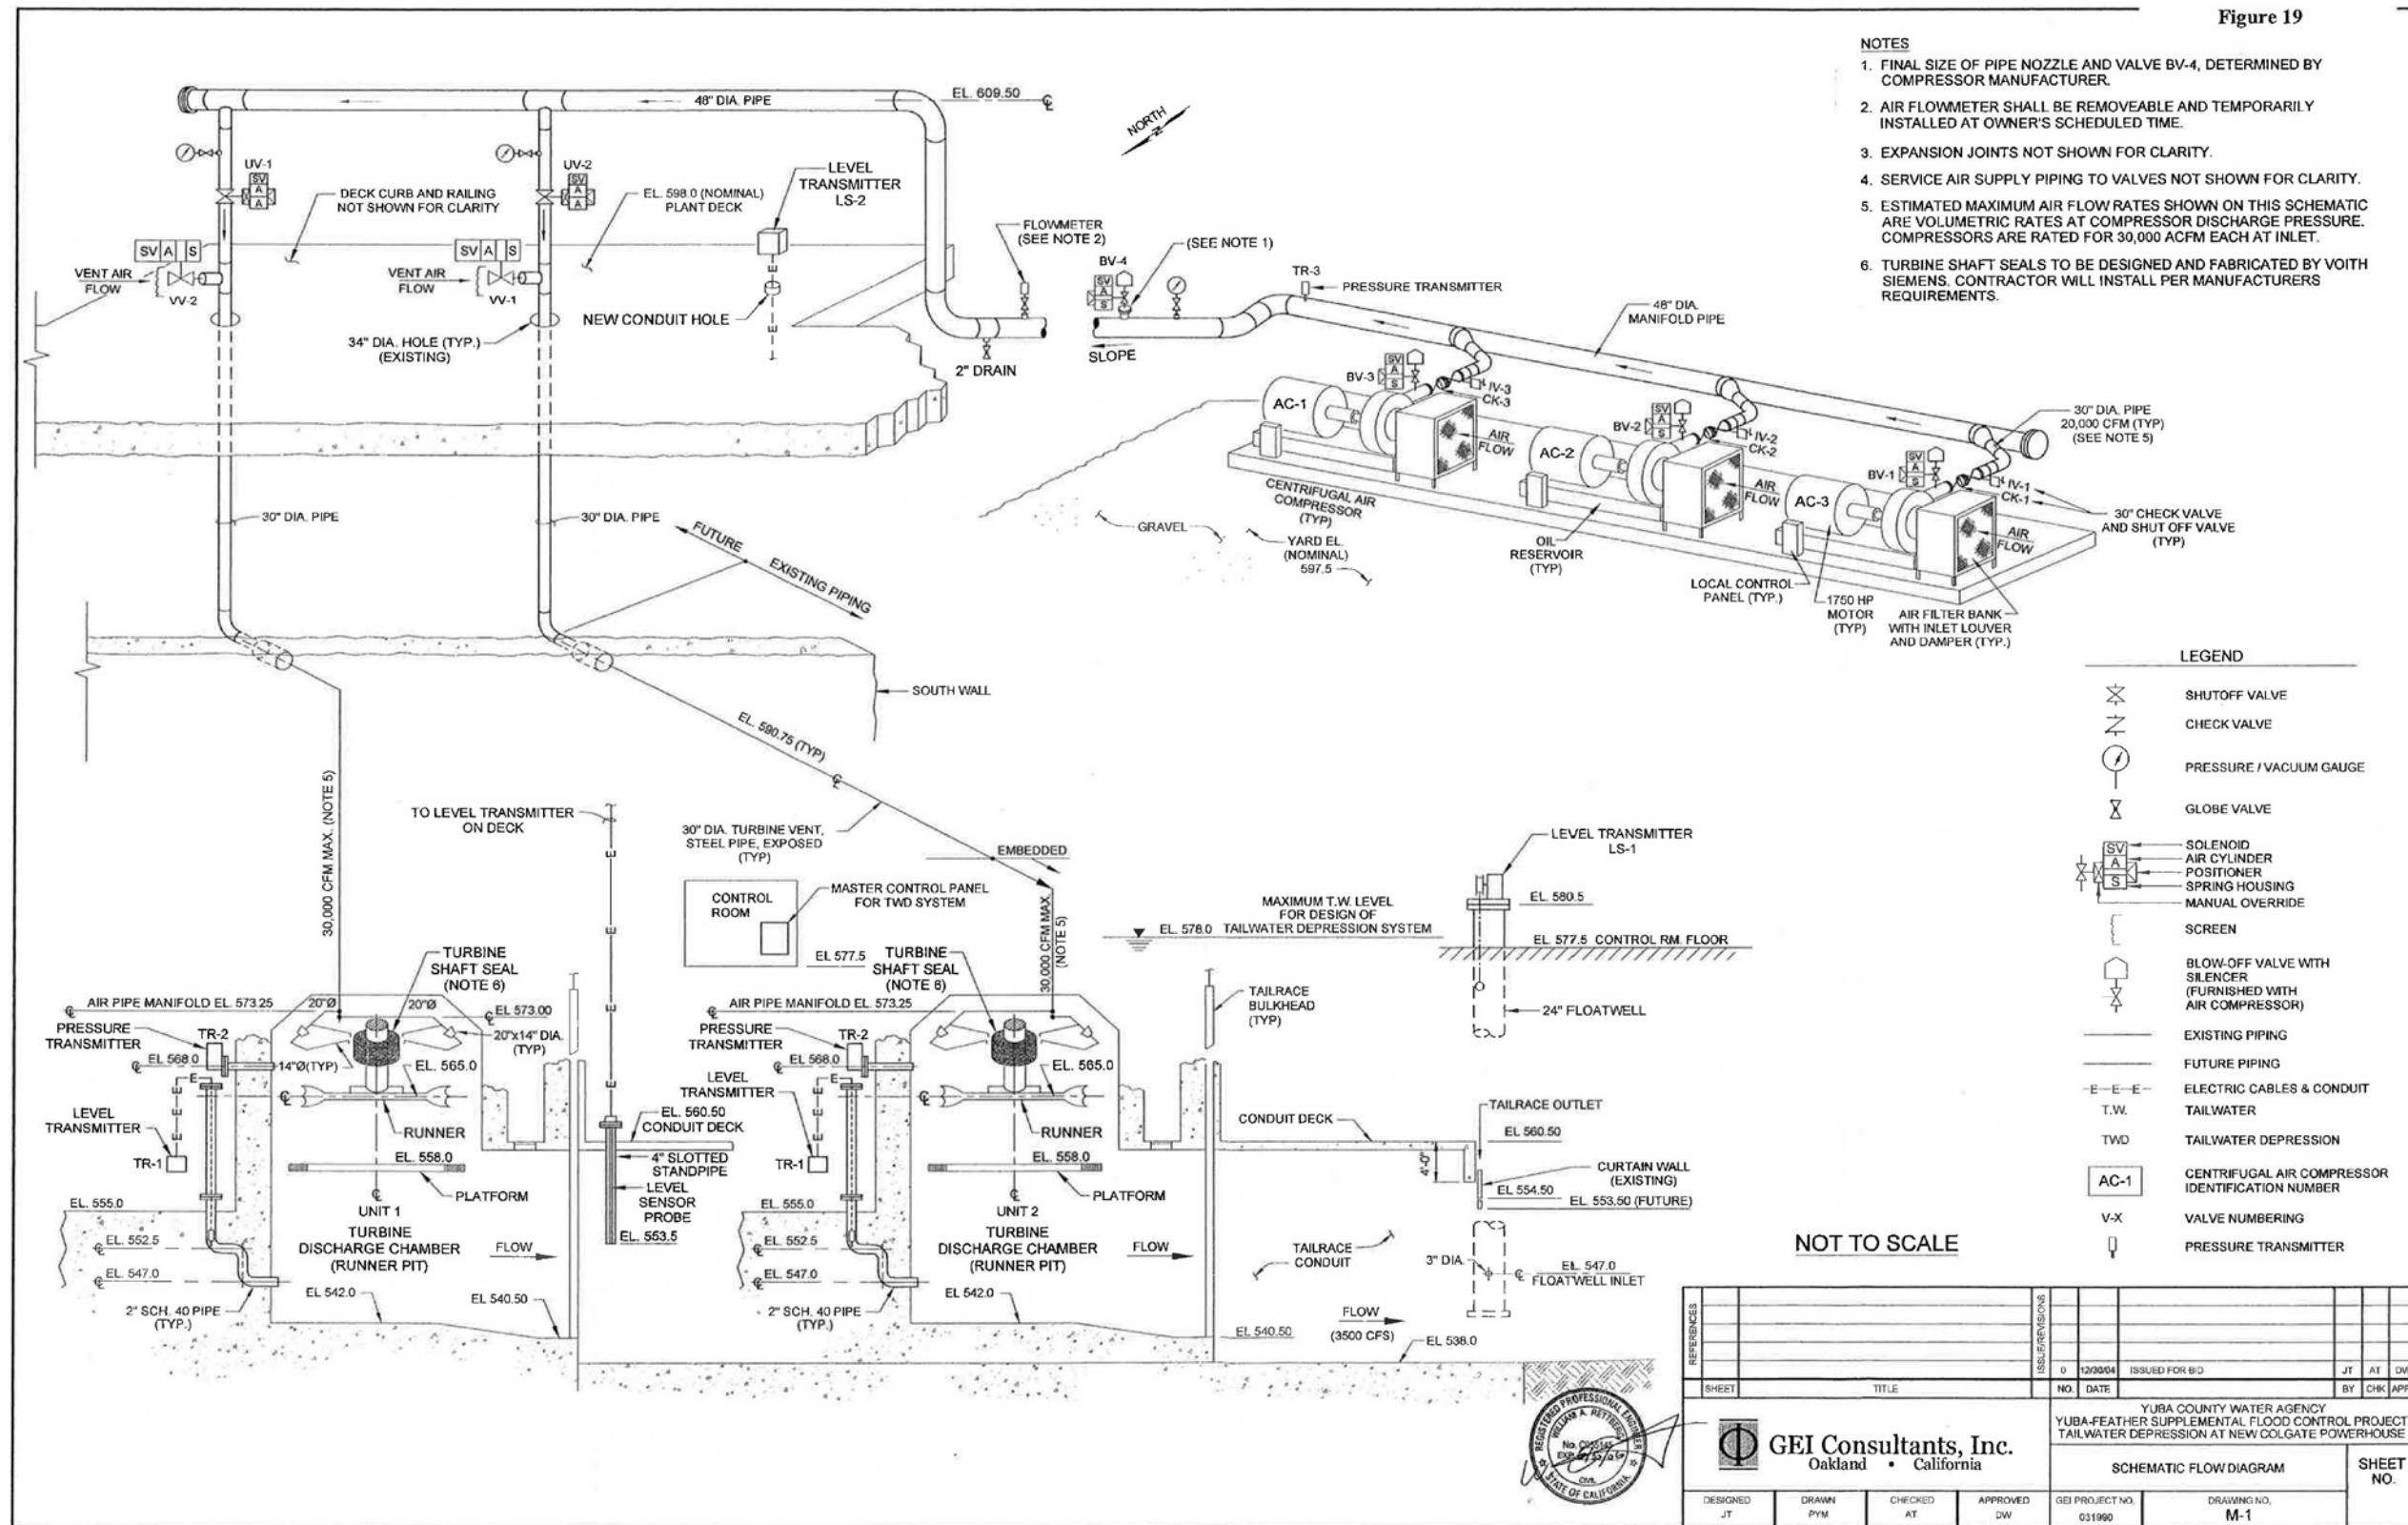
Concept-level plan schematic flow diagram for YCWA's proposed New Colgate Powerhouse TDS.
